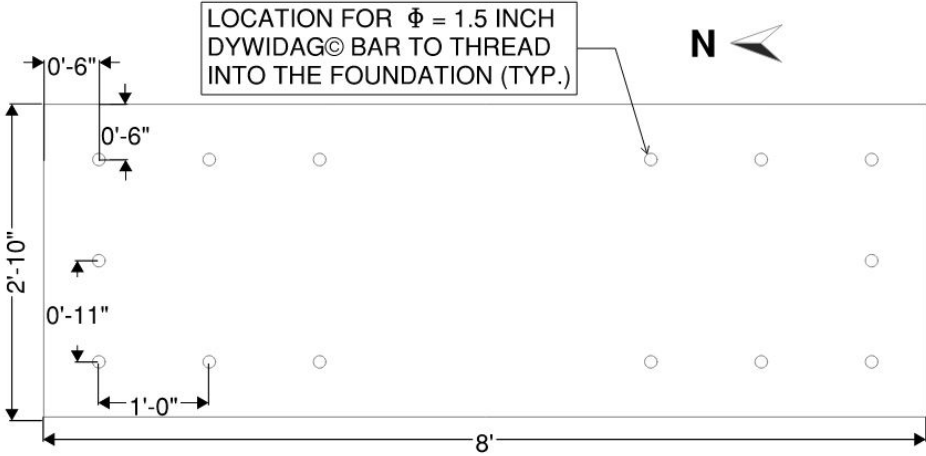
Foundation Plan View, Concrete Dimensions and Dywidag[®] Bar Locations for Foundation Tie Down
